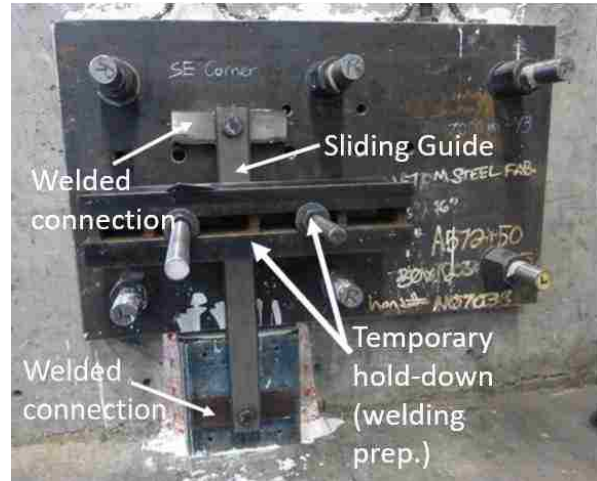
b: The guide held-down for welding preparation (the horizontal hold-downs were removed after welding)
